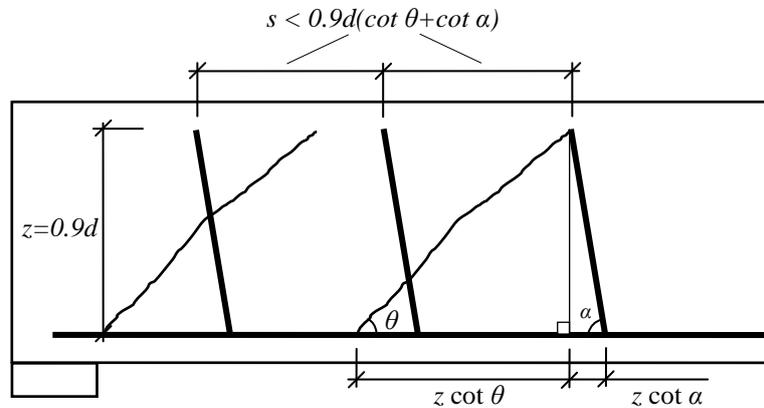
The spacing must be smaller than the maximum distance between two cracks in order to provide a certain overlap.
